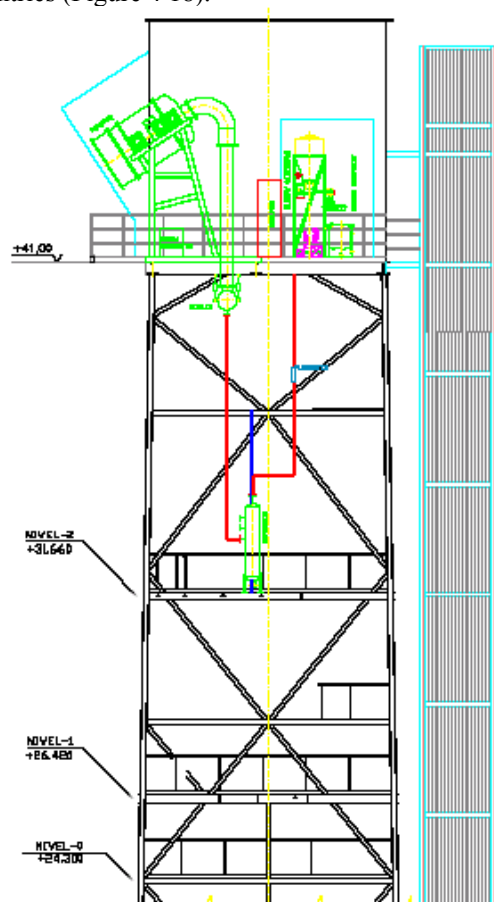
18. Schematic layout of the CRS-SSPS plant at PSA, Spain.
